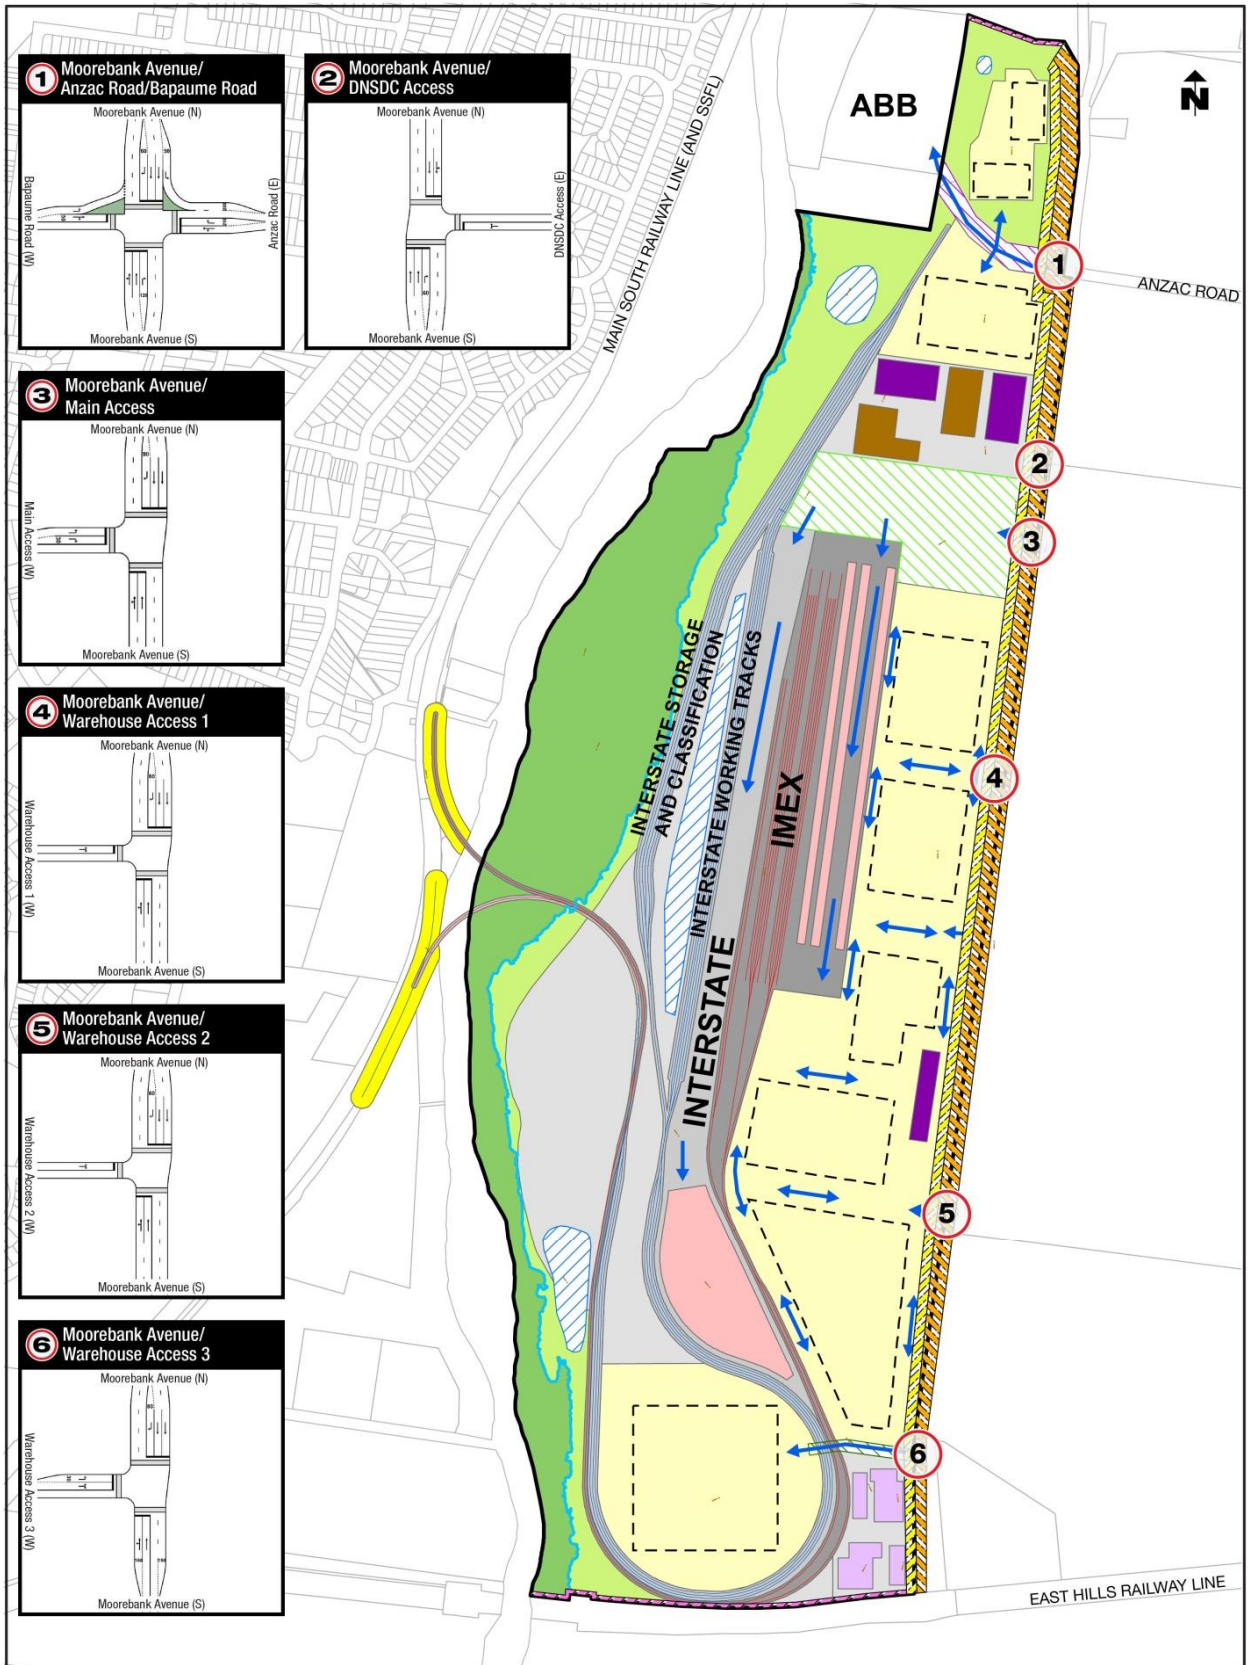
Proposed site layout and access point – northern rail access option at Full Build
